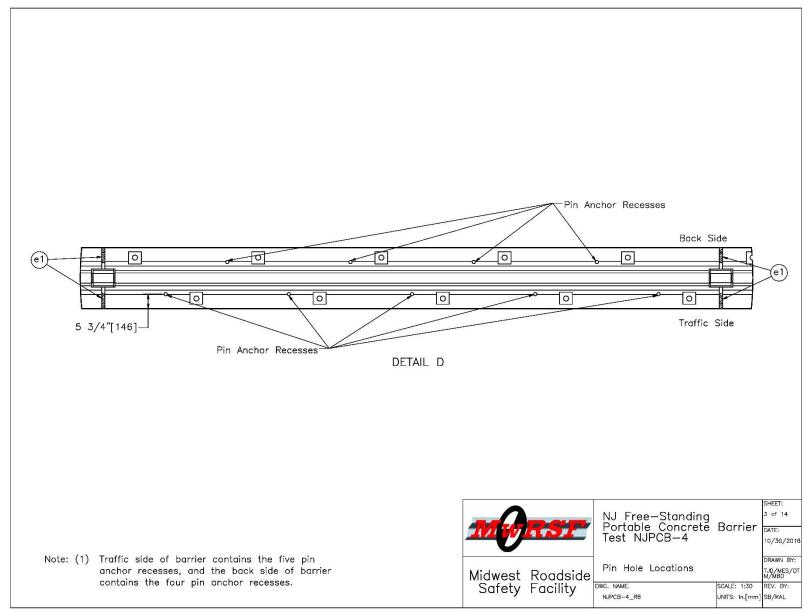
PCB Pin Anchor Recess Locations, Test No. NJPCB-4
